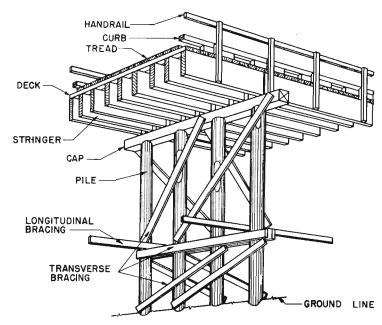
Highway bridge, class 50, single-lane, timber stringers on timber pile bent.
